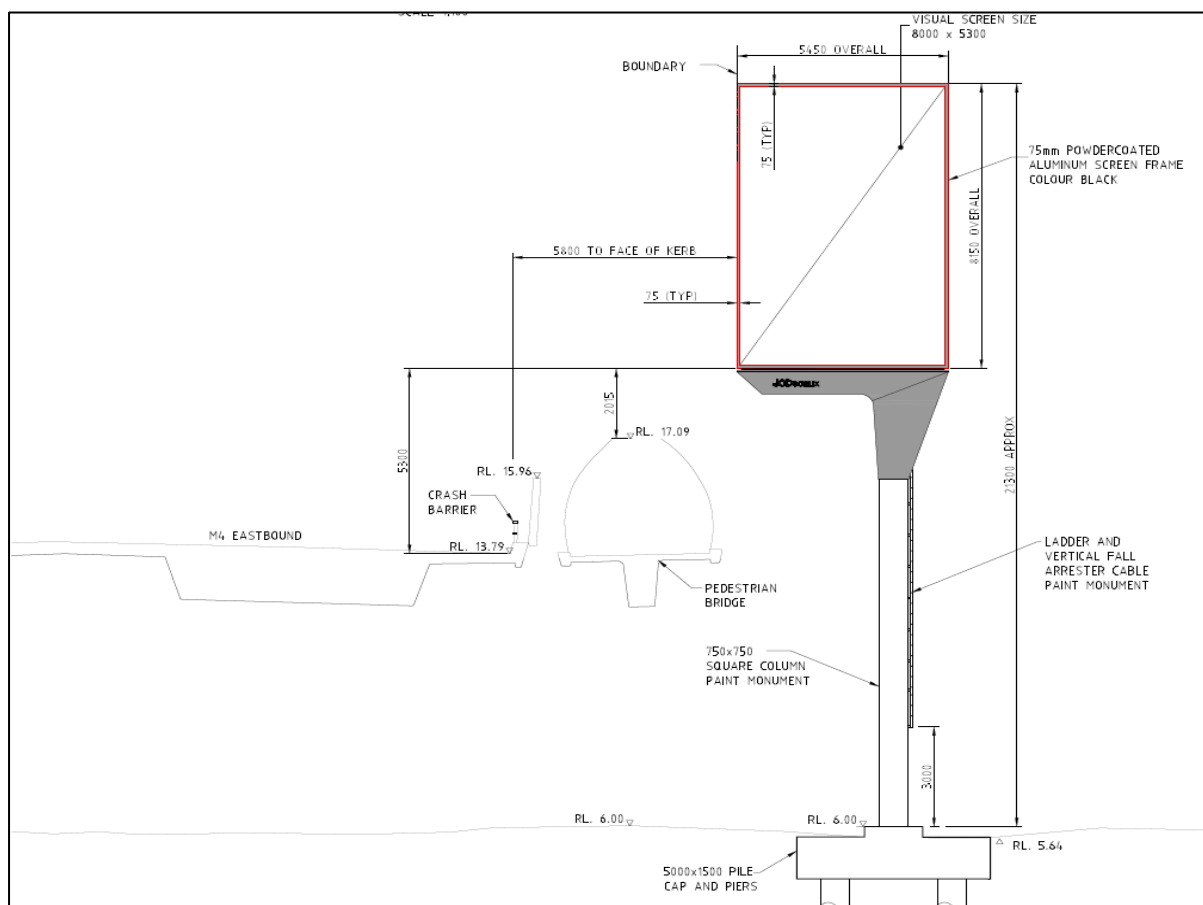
| Digital sign general arrangement as viewed facing west (Source: Proposed Digital Sign General Arrangement and Site Plan, Dennis Bunt Consulting, 2022)
